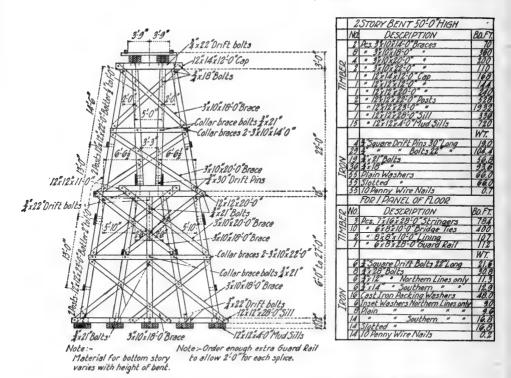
PLANS OF TIMBER FRAME TRESTLE. ILLINOIS CENTRAL RAILROAD.
